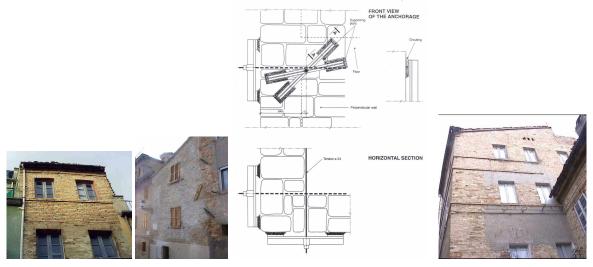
a) typical building; b) modern ties insertion; c tie anchorage constructional detail; d) grouting to improve capacity of spandrel walls.
